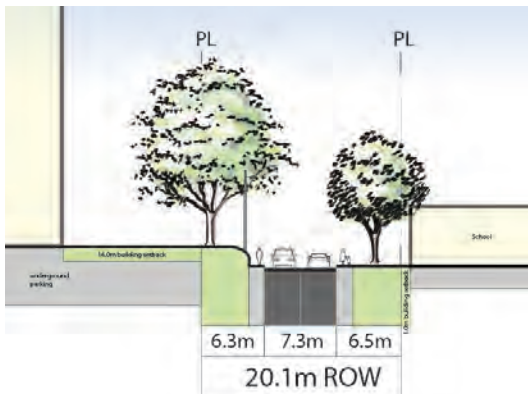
Mountview Avenue, illustrative street cross-section diagram.
